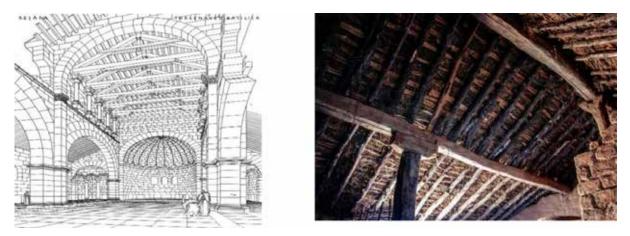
'Western' typical roof consisting of wood planks type in Numentia - Spain (photo D. Safrai)
